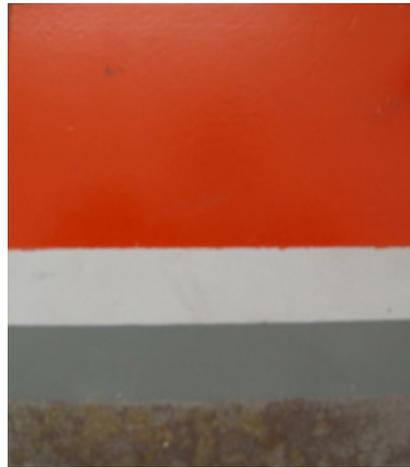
Steel finish sample showing cut back layers starting with raw steel (Bottom), 1st layer primer, 2nd layer primer, finish coat (Top). Also an example of how to apply step back paint process for field welding and later paint blending.
